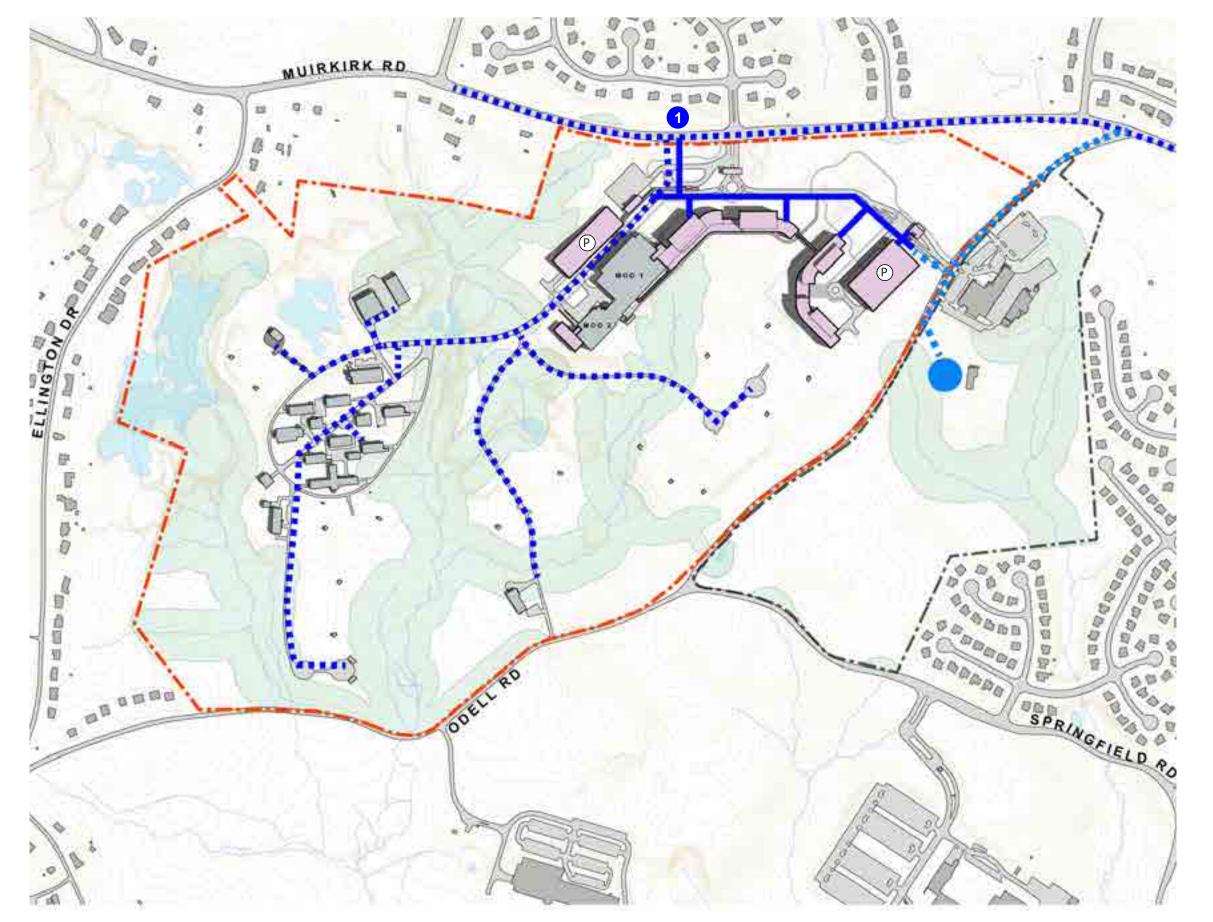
shows the approximate location of the existing underground electric and telecom duct bank serving the MOD 1 and MOD 2 site. This duct bank will need to be relocated as it falls within the footprints of the proposed buildings for each proposed alternative. Existing electrical utility easement for overhead power lines leading to the BRF site will be maintained as will existing telecom lines leading from the BRF to Odell Road. See Figure 1-45.
